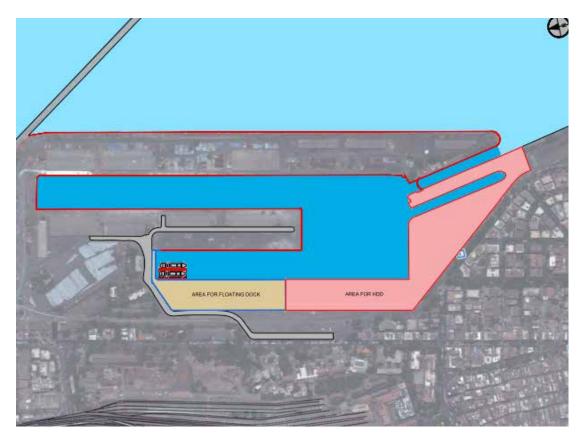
Proposed Plan for Creating Dry Docking Facilities at Indira Dock
